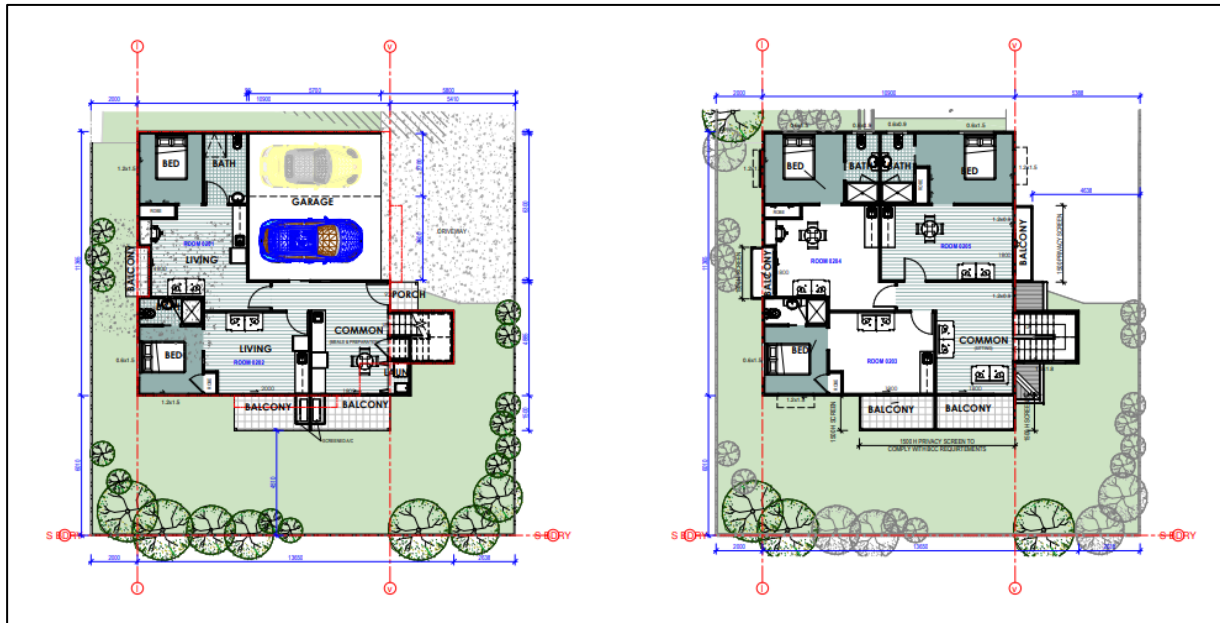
Extract of proposed site/landscape plan depicting the rear dwelling.
